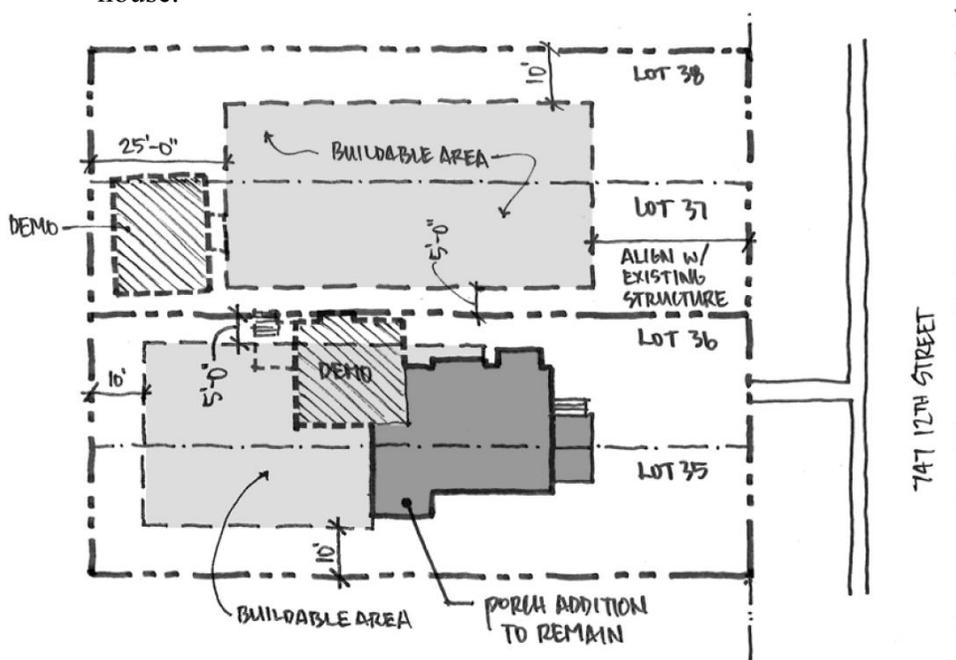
Applicant's Proposal #2: Lot Subdivision.
